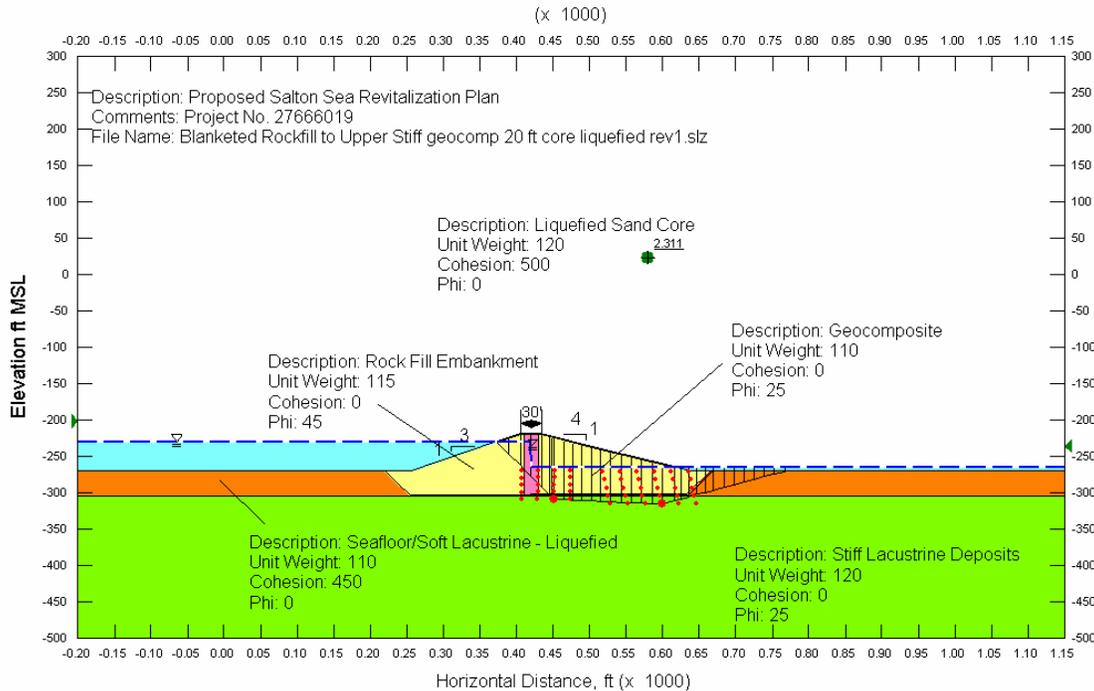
Typical cross-section of the SSA rockfill embankment.
